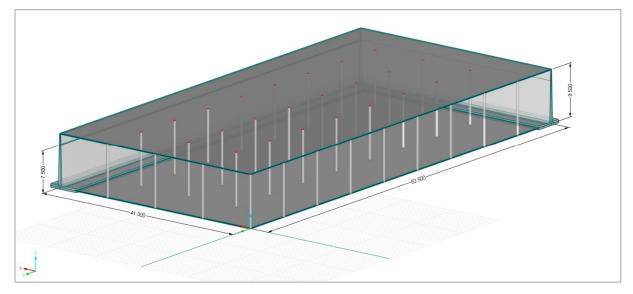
Type 2 - Conventional above ground rectangular reinforced concrete reservoir (m)
